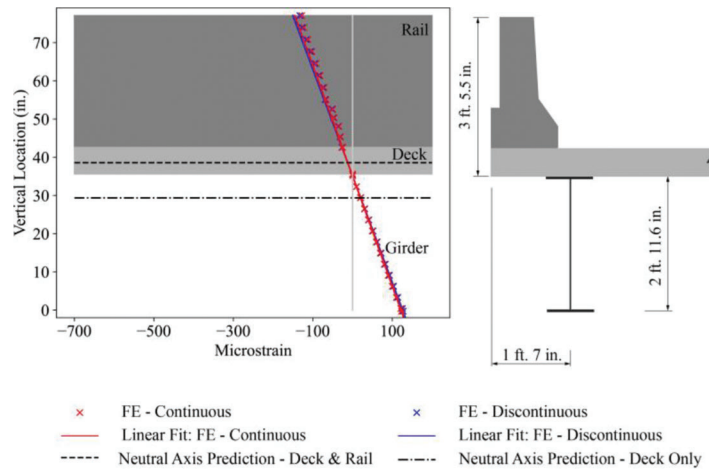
Effect of rail discontinuity for damaged steel girder bridge (Asset 037-55-05265): FE predictions for strains at Location M6.
